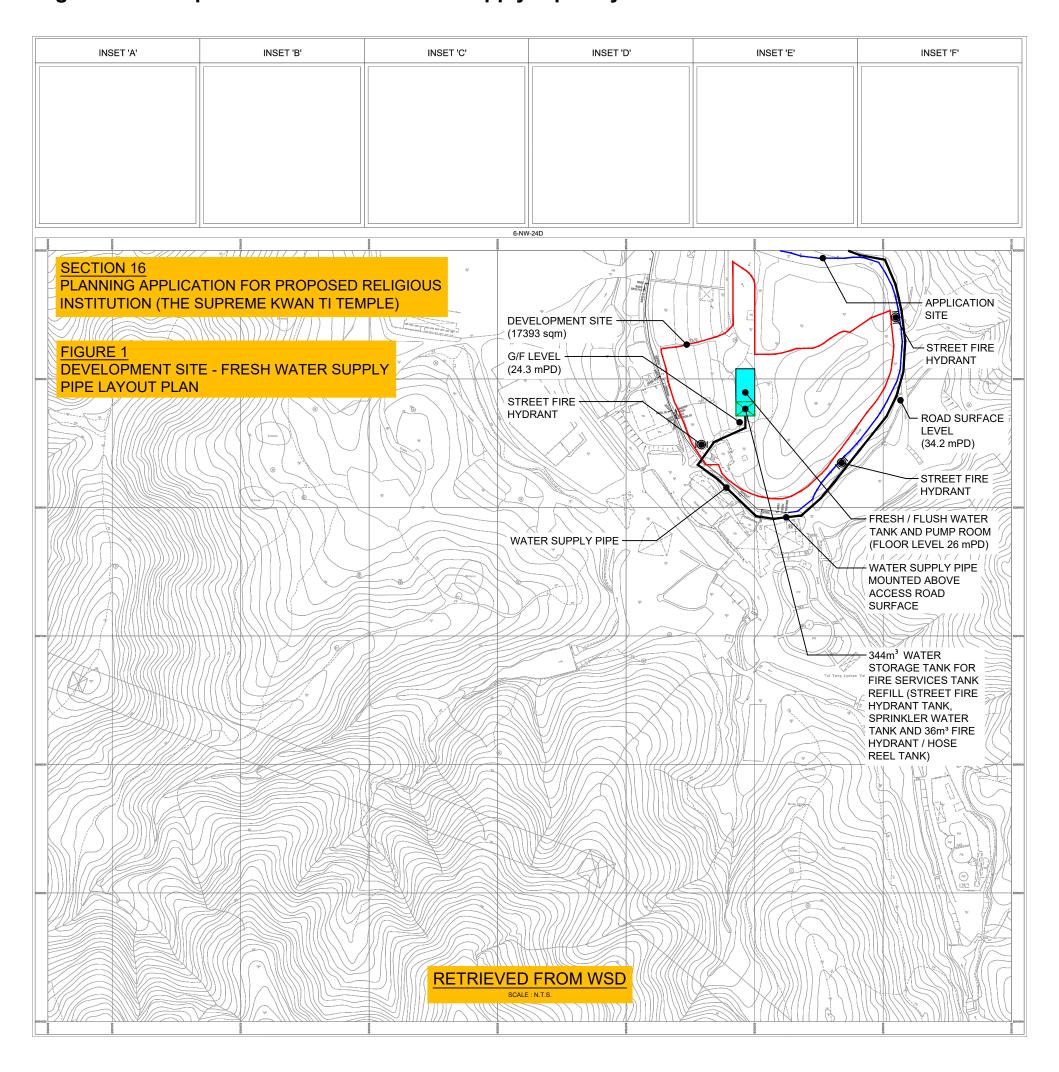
WSD Water Main Connection Point and Water Supply Pipe Layout Plan
